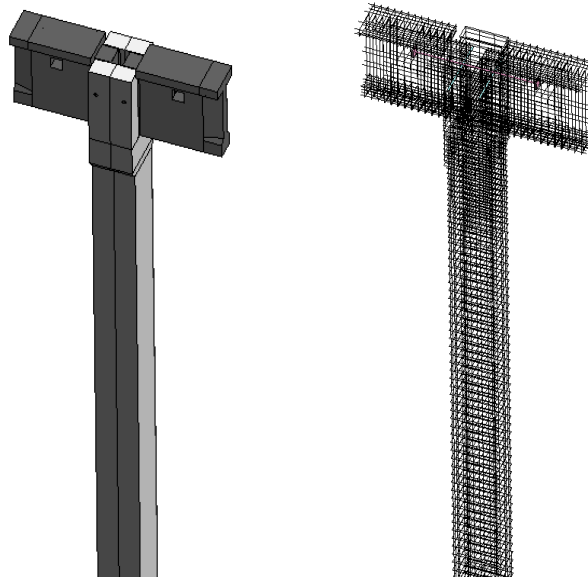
Beam-column proposed connection modelled in Atena (solid geometry and reinforcement geometry).
